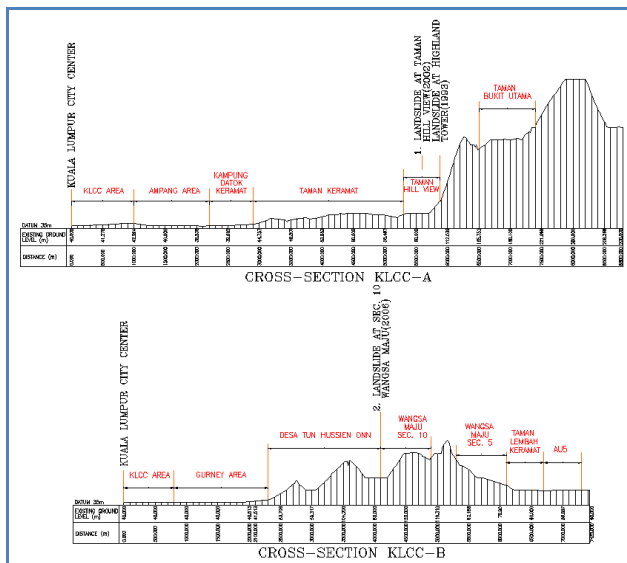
Cross-section KLCC - A refer to the collapse of Highland Tower and the landslide in Taman Hill View. In the essence of cross-section KLCC –B shows the location of landslide at Wangsa Maju.
